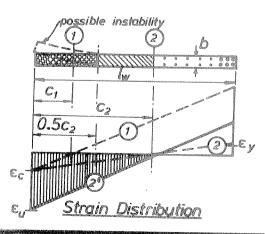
Strain Patterns for a Rectangula Wall Section Subjected to Flexure and Axial Load.
